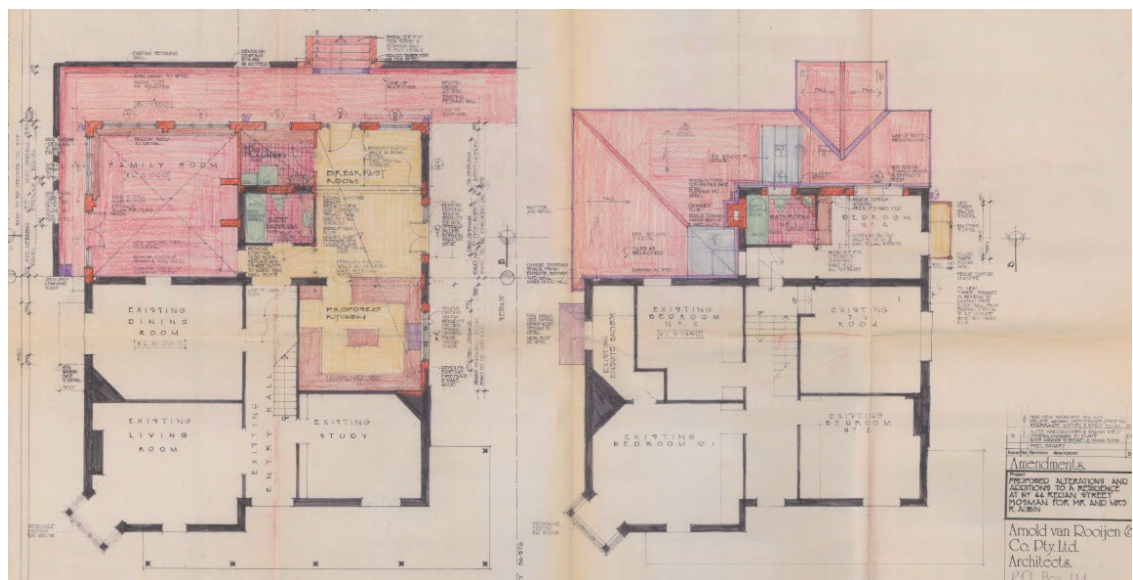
Approved plans 1983 plans for alterations and additions and changes to the floor plan.
